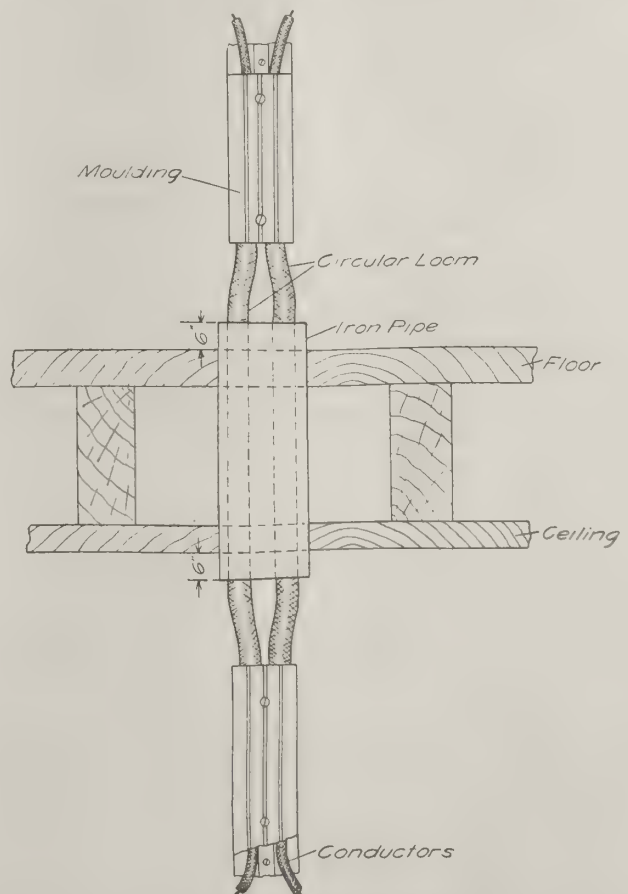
IRON PIPE FOR PROTECTING CONDUIT THROUGH FLOORS.
